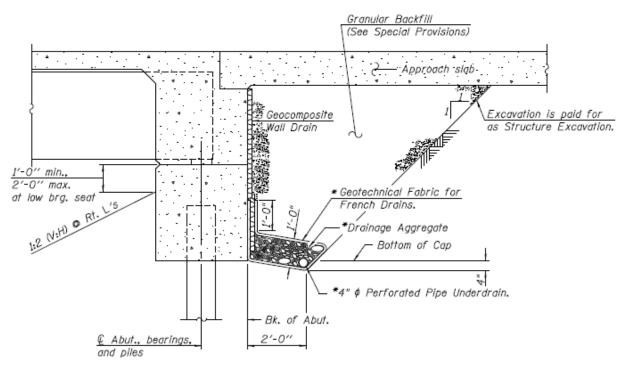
Typical section through IDOT integral abutment (IDOT 2012b).
